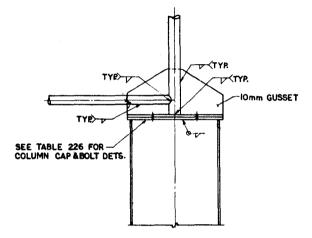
DETAIL T4 FOR LEAN TO ROOF TRUSS
